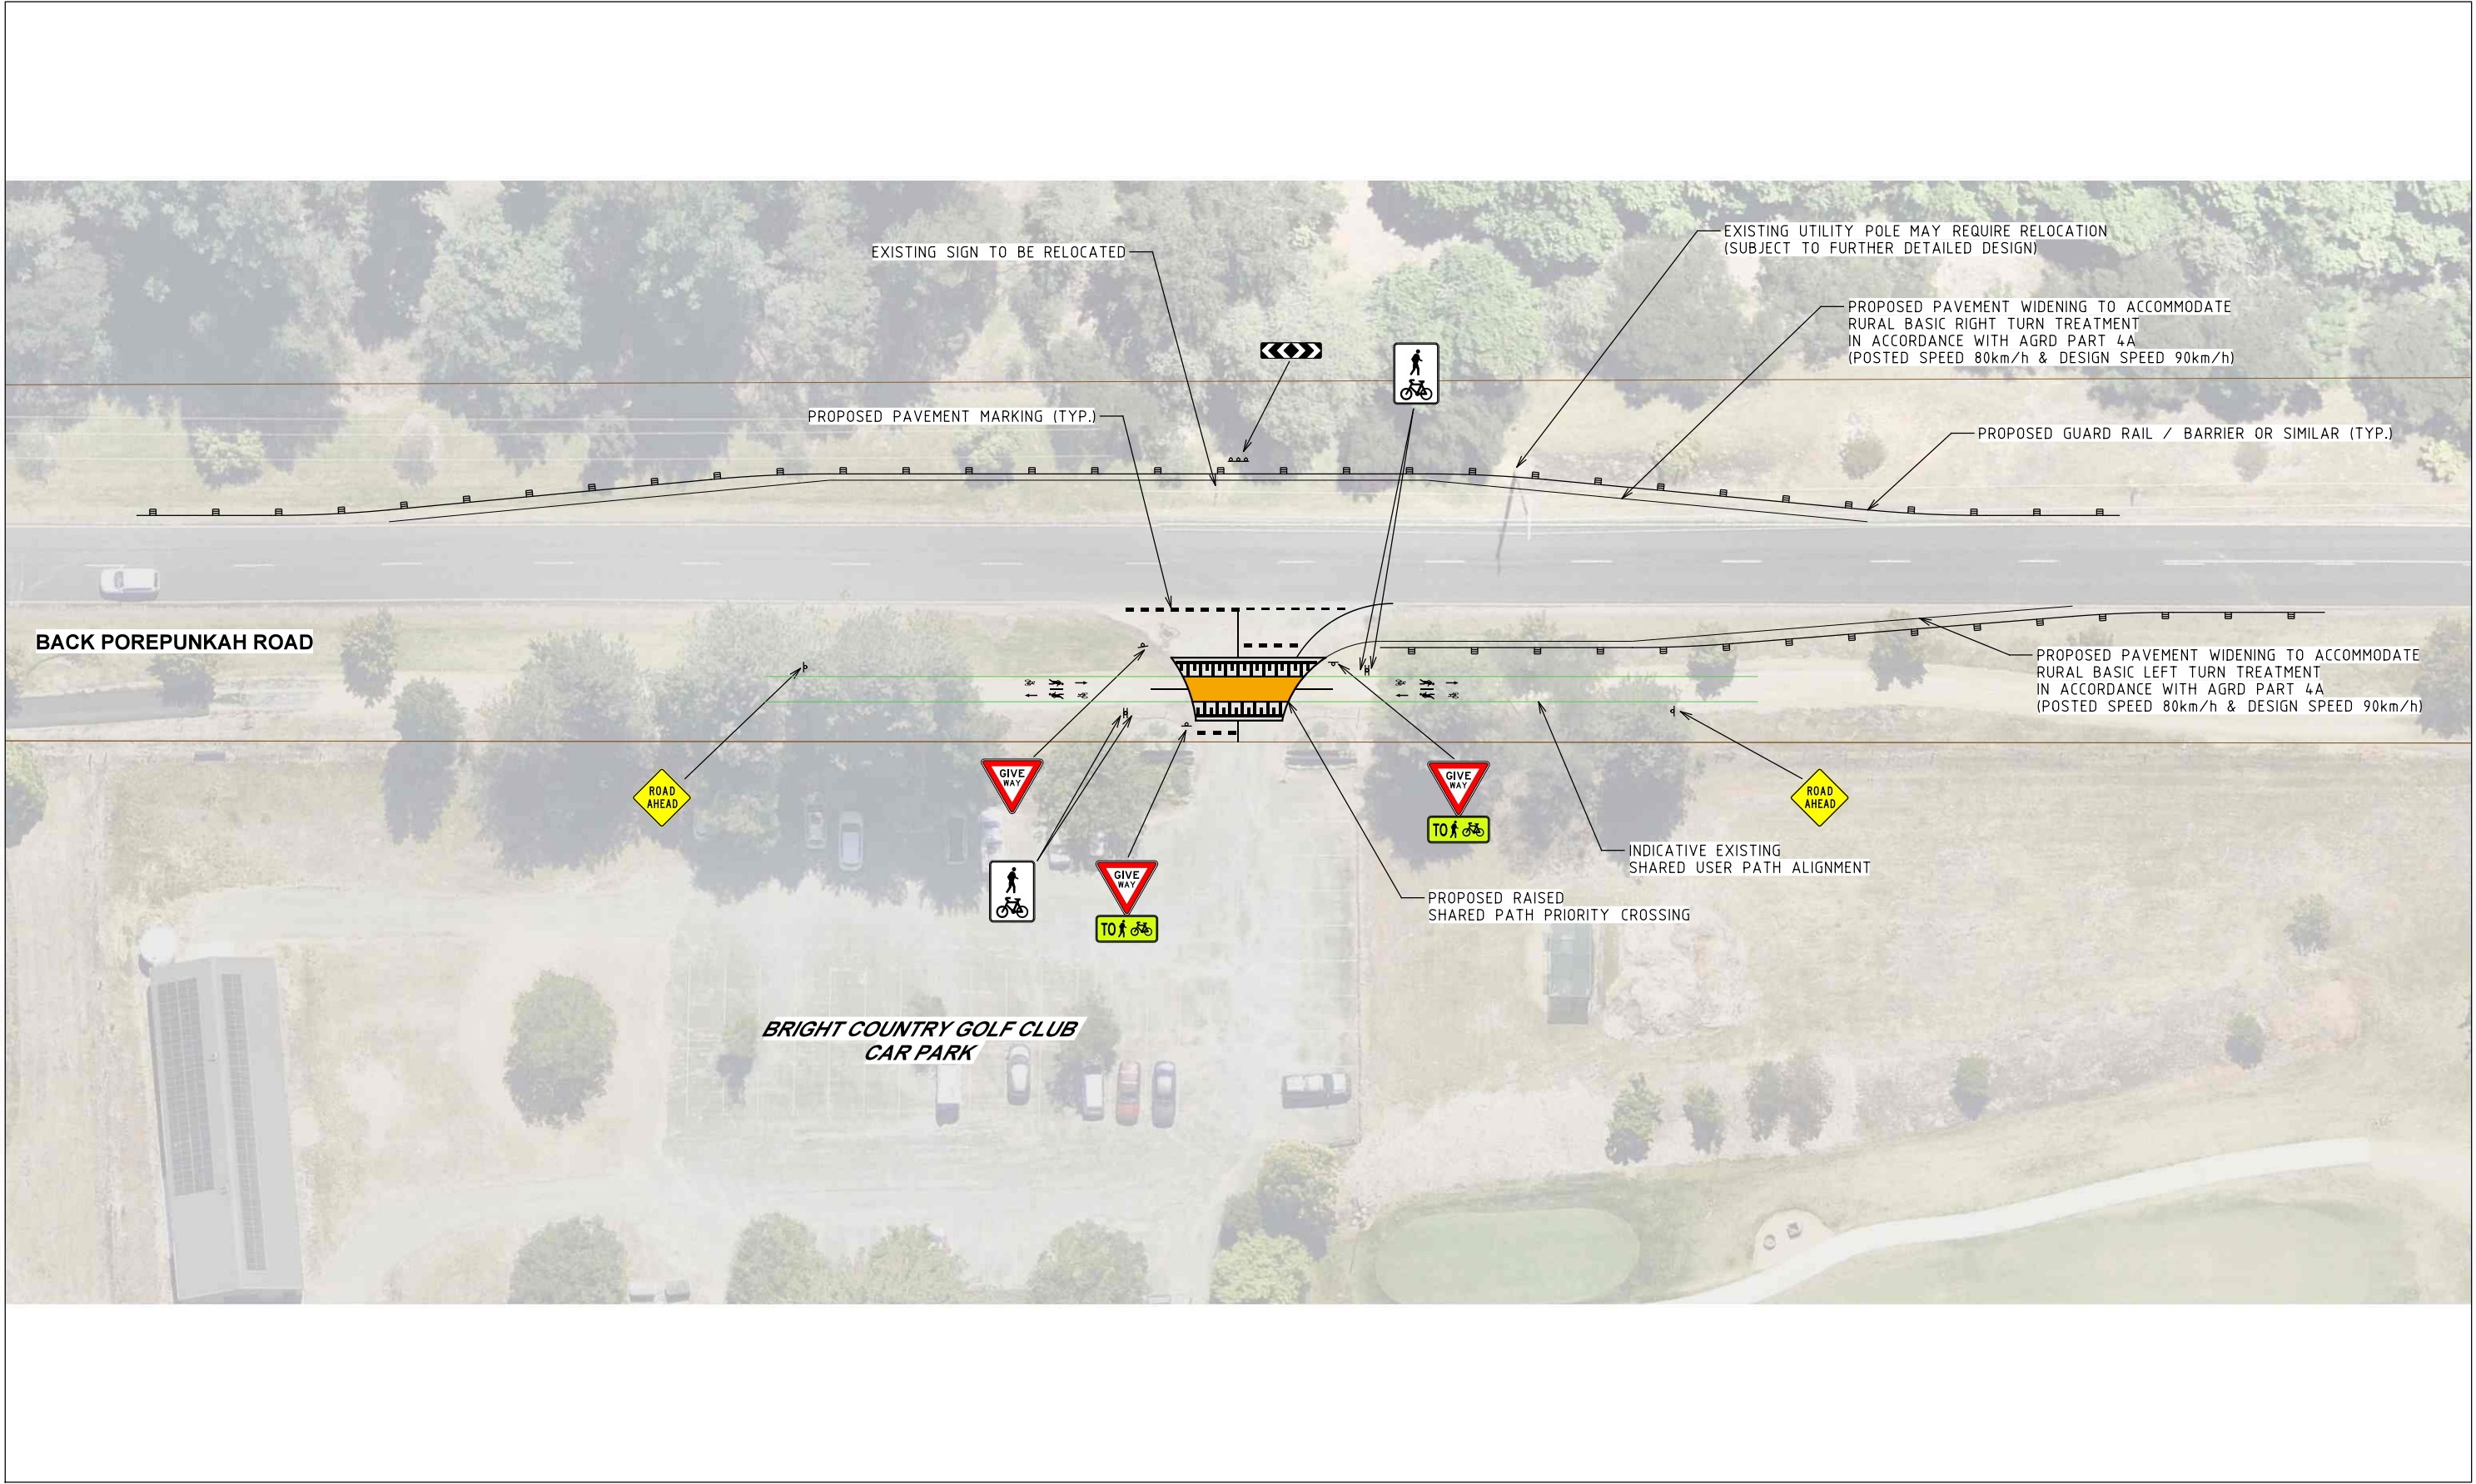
Recommendation 22 – Typical Property Access & Murray to Mountains Trail Intersection
